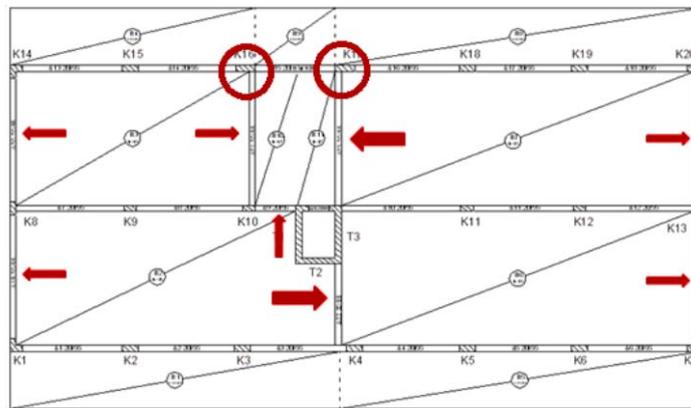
Structural members in the first floor layout of the R/C building most likely to fail under seismic loads
